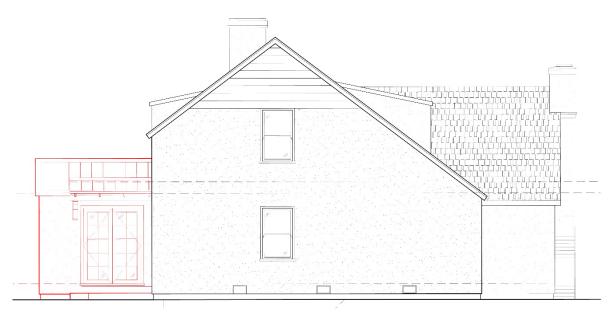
Elevation drawing of the north facade illustrating areas of new construction and alterations in red. Source: "Proposed Remodel For: The Bettman Residence" prepared by Flury Bryant Design Group, Inc. (dated July 16, 2024), Sheet 7. Edited by Page & Turnbull.
